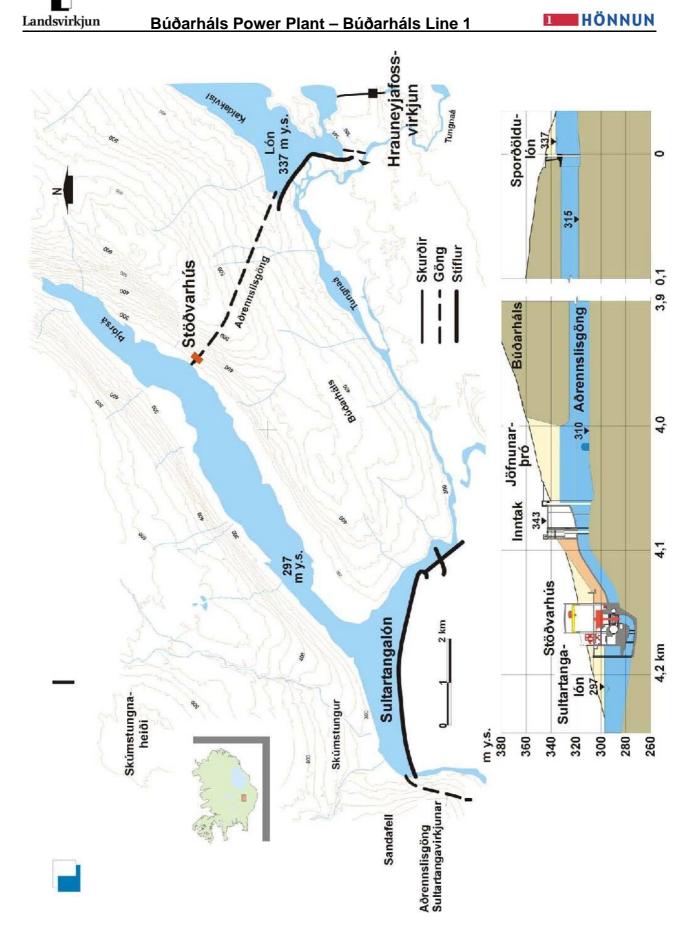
Cross-section of the tunnel and powerhouse of the Búðarháls power plant
